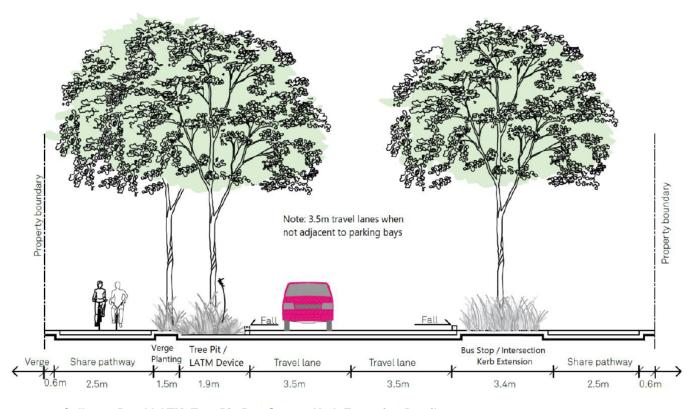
Collector Road LATM, Tree Pit, Bus Stop or Kerb Extension Details
